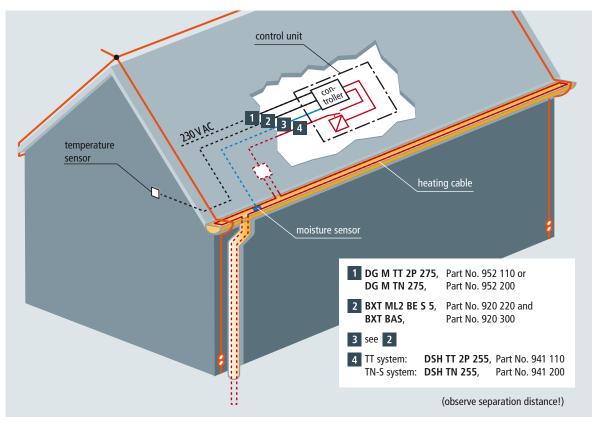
Installation of lightning current and surge arresters in case the control unit is not located near the entrance point into a structure with external lightning protection system
